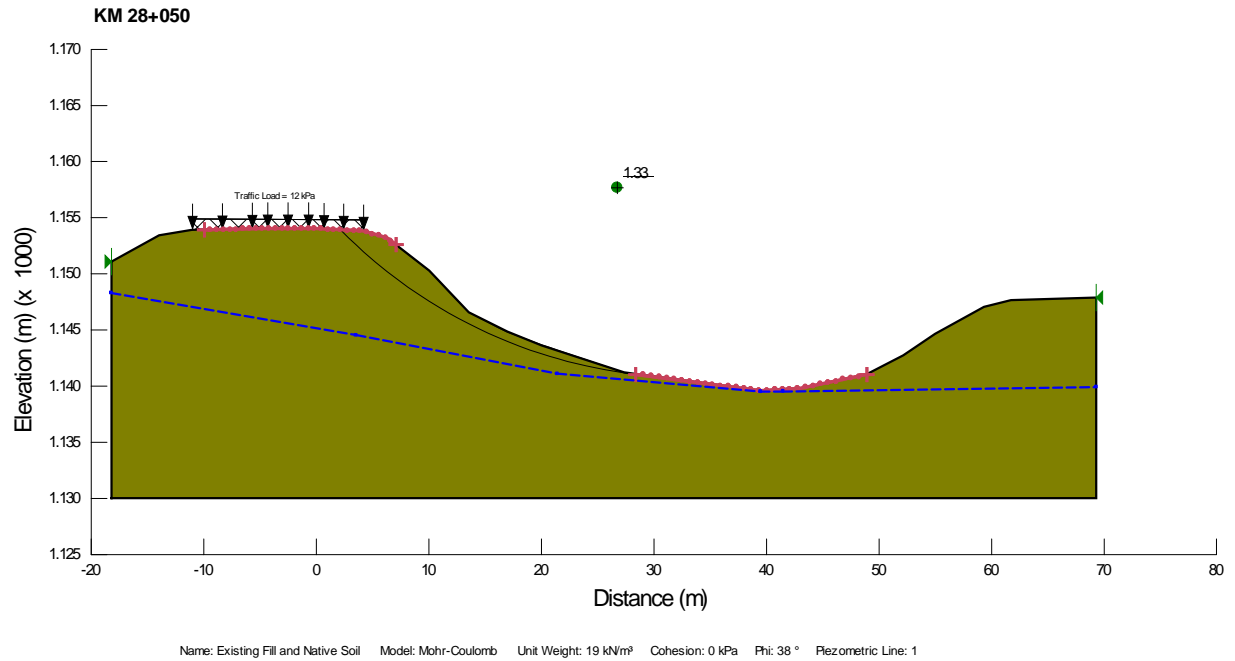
Station 28+050 - Global Stability of the Existing Slope
